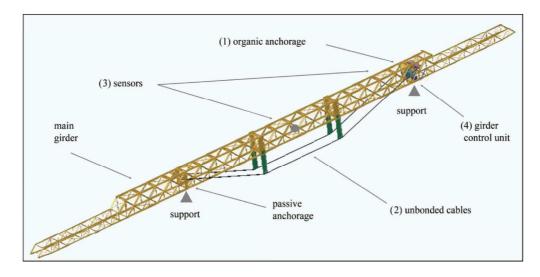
3D scheme of one OPS movable scaffolding system main girder9.
